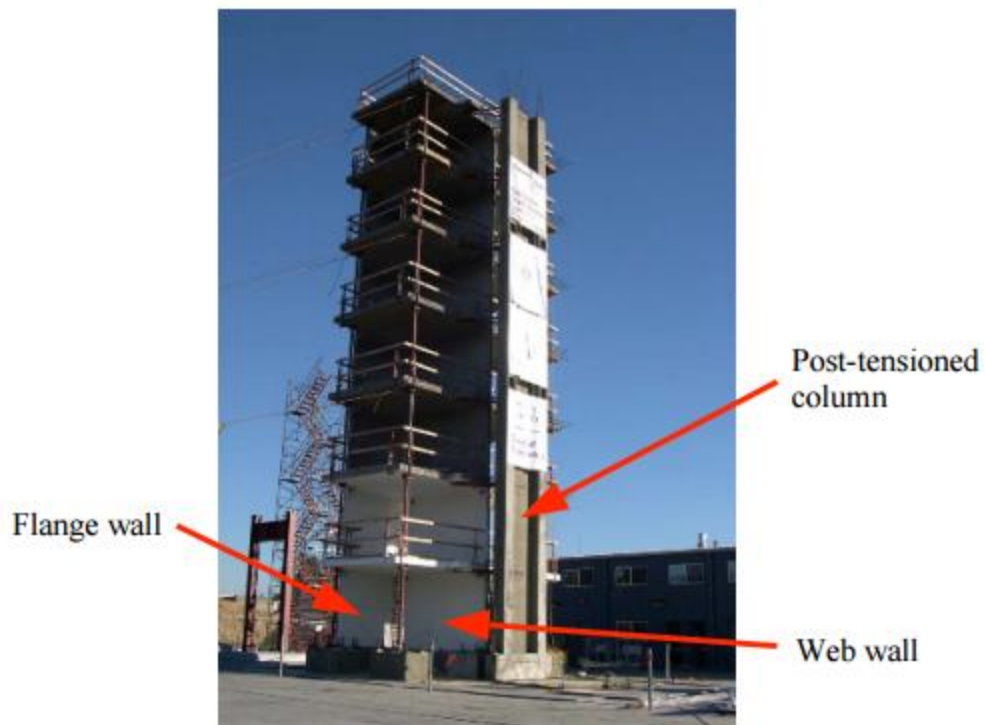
Full-scale 7 story test structure [Alves, 2007]
